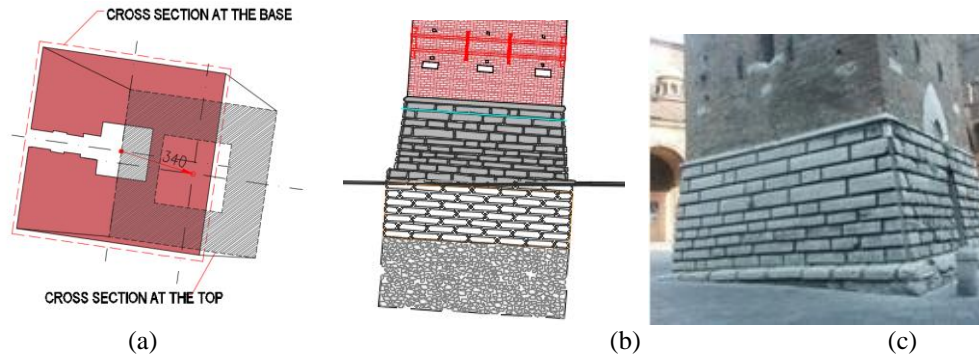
a) Tower cross section at two different heights (b) Foundation (c) External selenitic stones
